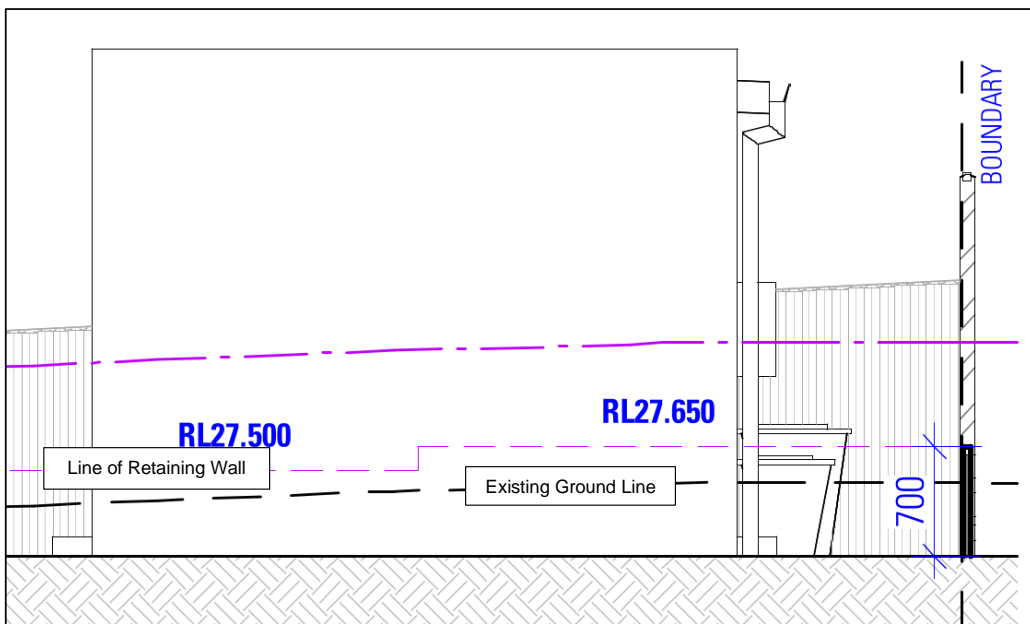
Southern Elevation showing retaining wall beyond property boundary
